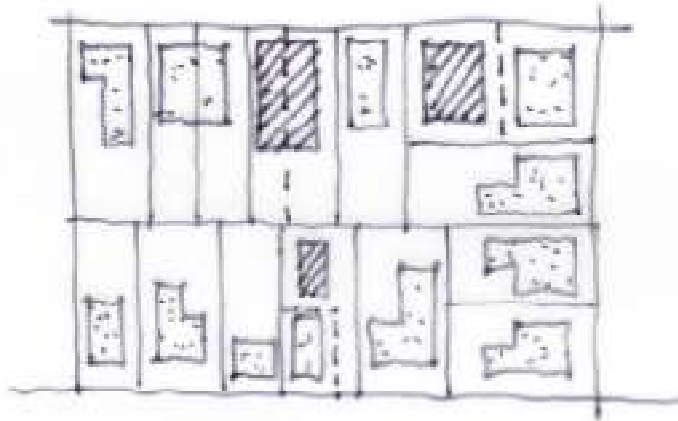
New buildings as infill and also as part of a subdivision should respect the scale and character of the streetscape.
